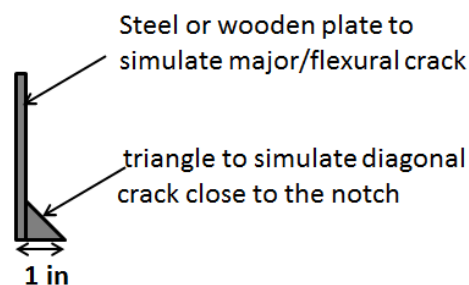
Steel or wooden plate to simulate the diagonal crack along with notch in beam specimens
